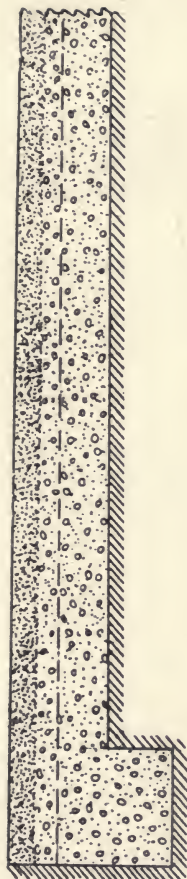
Cross-section of part of concrete road, showing suggested section of out-side edge where not supported by kerbing.
